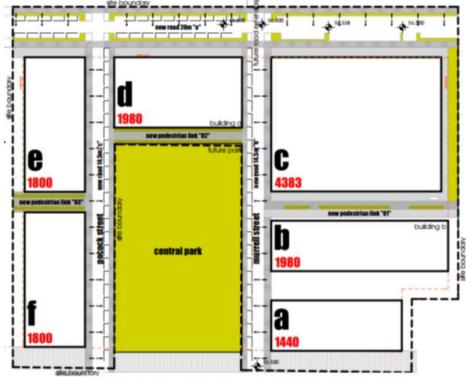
Indicate plan demonstrating the buildings layout, proposed road and pedestrian connections layout. Source: Statement of Environmental Effects prepared by Ethos Urban.
